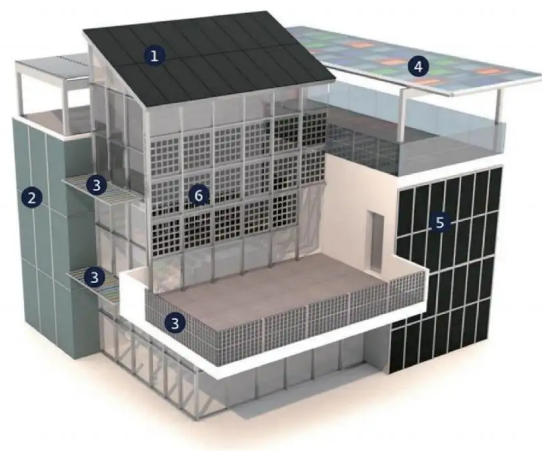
(1) Roof, (2) PV rain curtain, (3) PV sun shield, (4) PV skylight, (5) PV facade, (6) PV wall. Adopted from [\(3\)](#).
